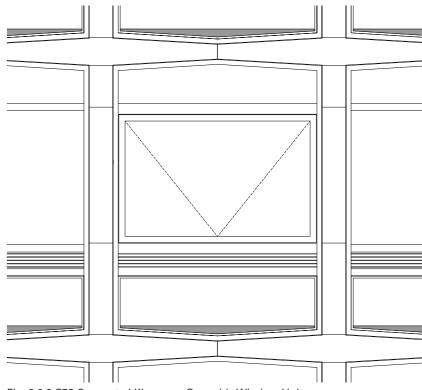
S73 Consented Kingsway Openable Window Unit
